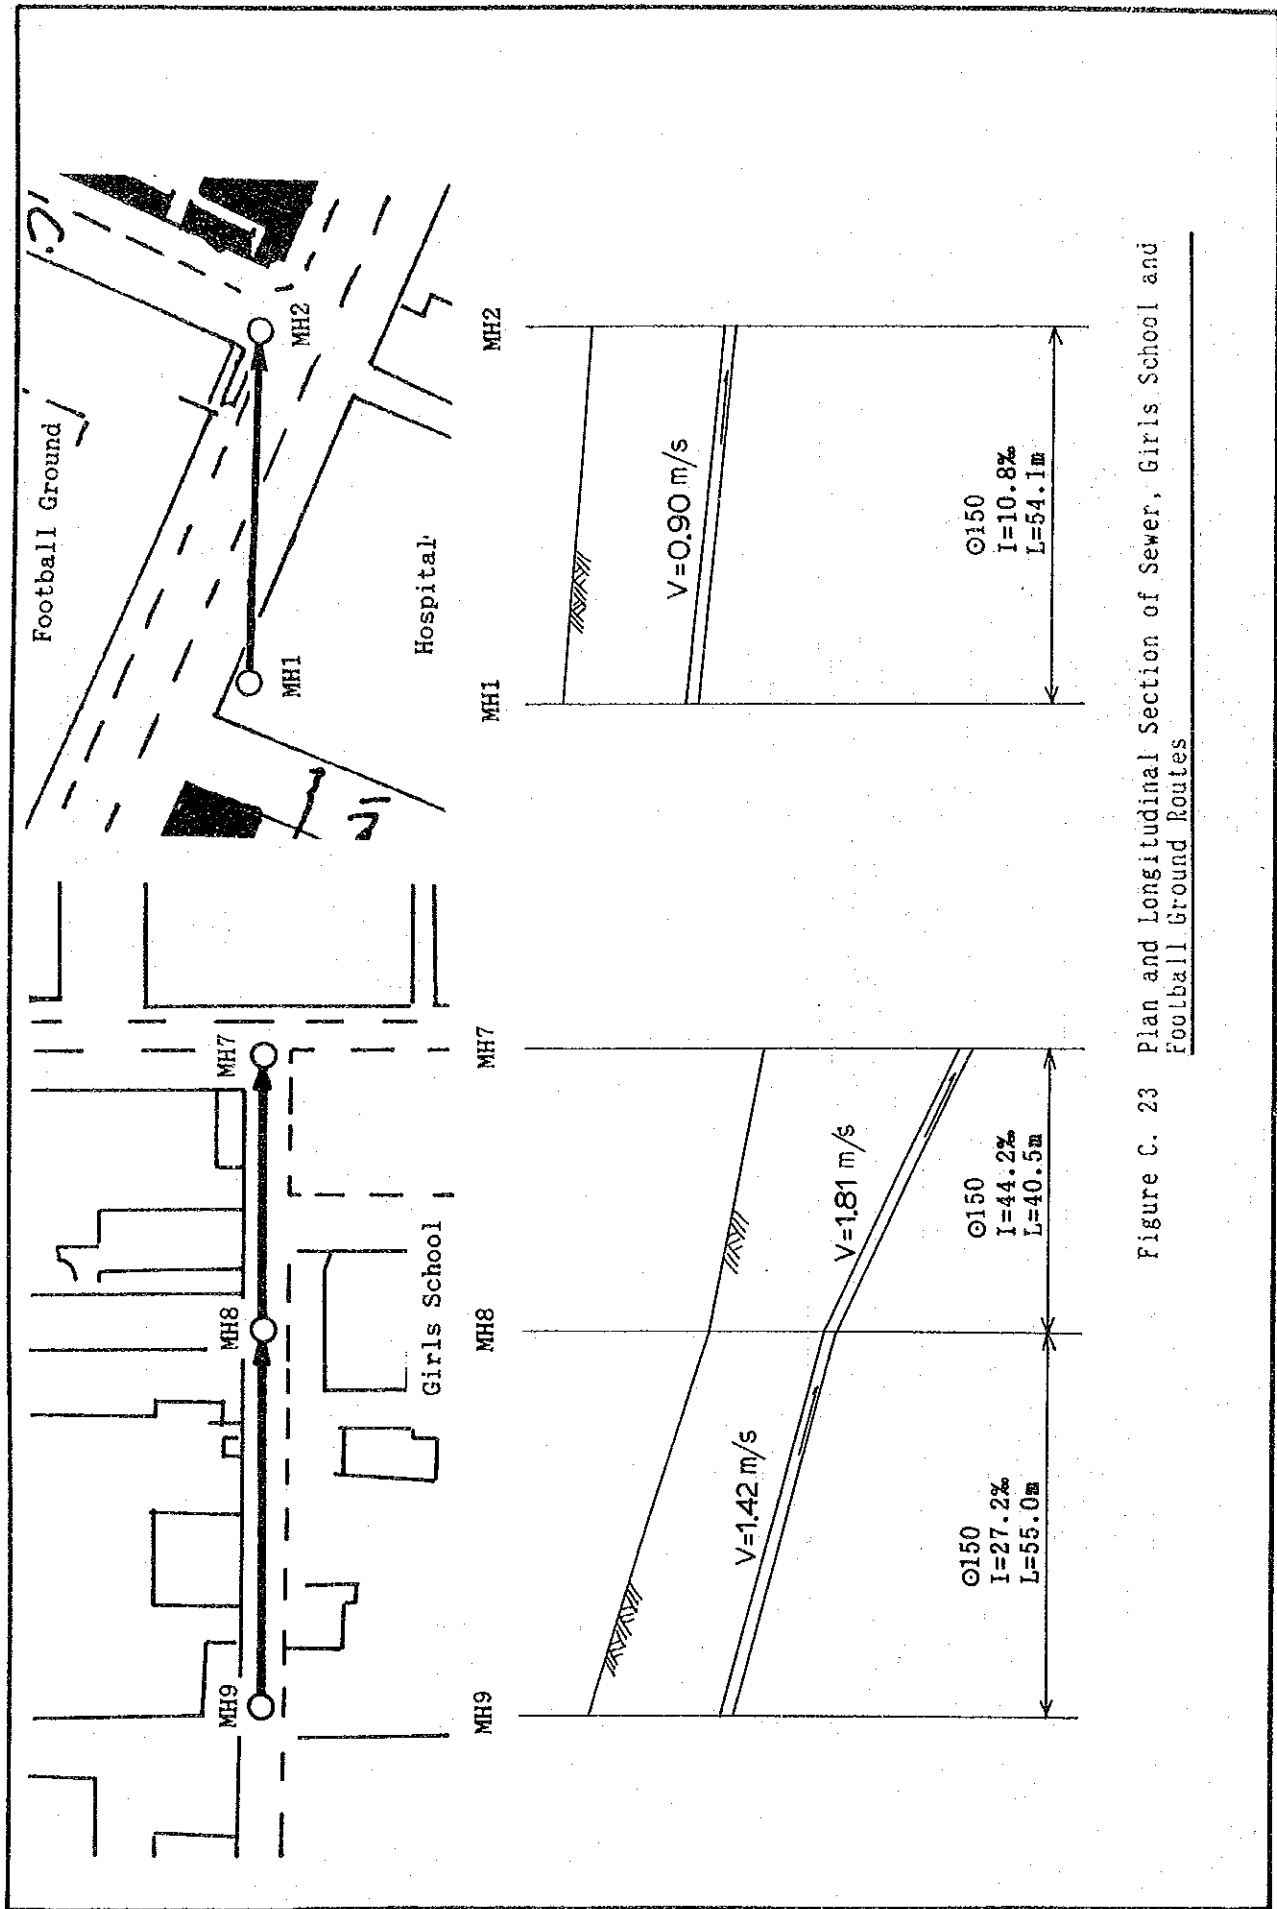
Plan and Longitudinal Section of Sewer, Girls School and Football Ground Routes
